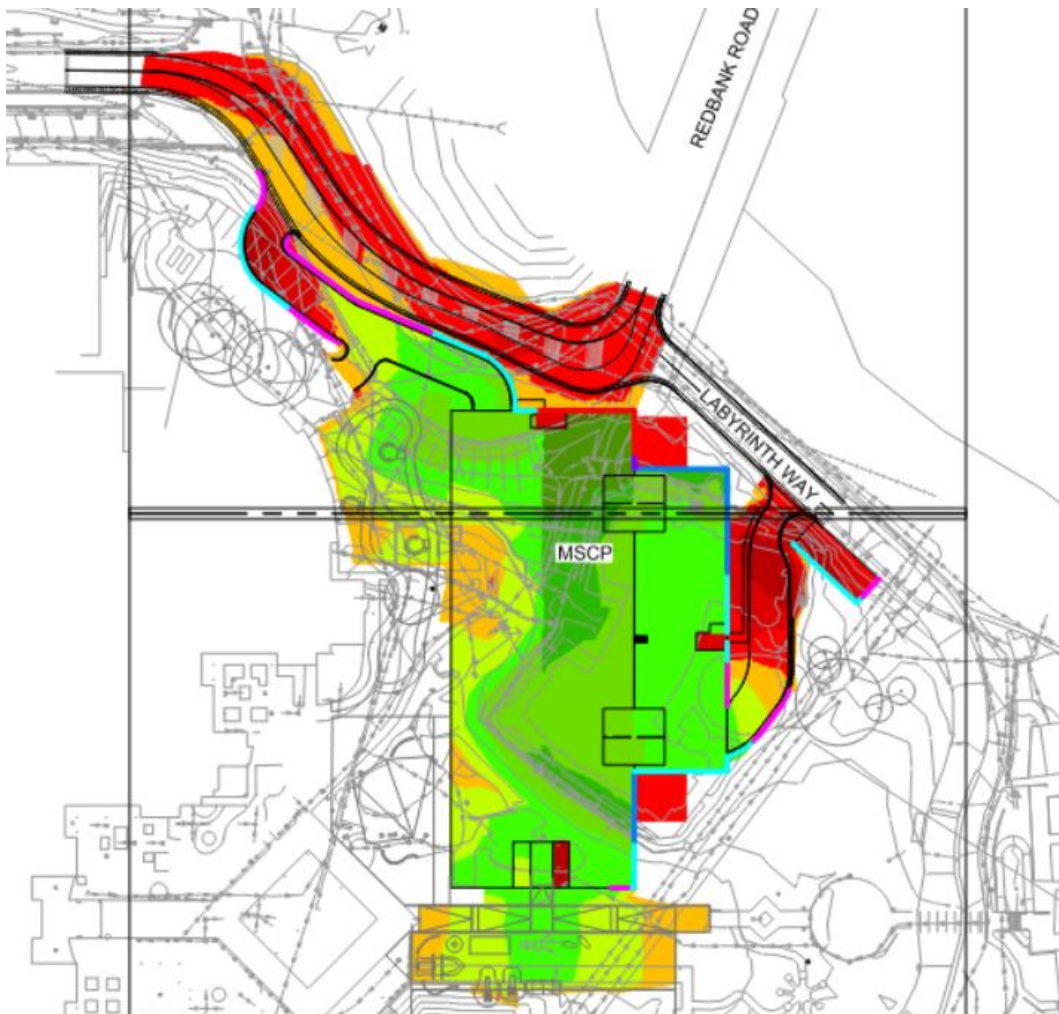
Proposed MSCP earthworks plan (red/orange indicate cut; greens indicate fill)
